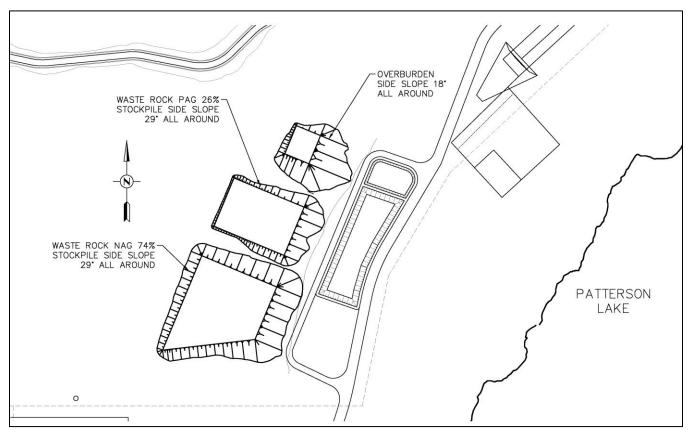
General Arrangement of Waste Rock and Mine Backfill Material Storage Stockpiles
